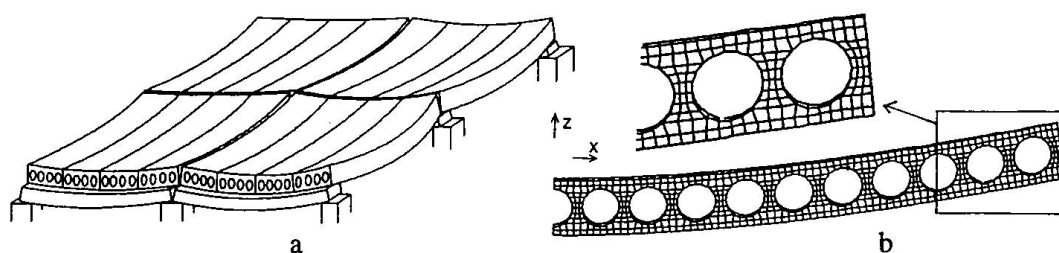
a) Deformed PHC floor. b) Deformed slab end. Centerline on the left, longitudinal edge on the right
